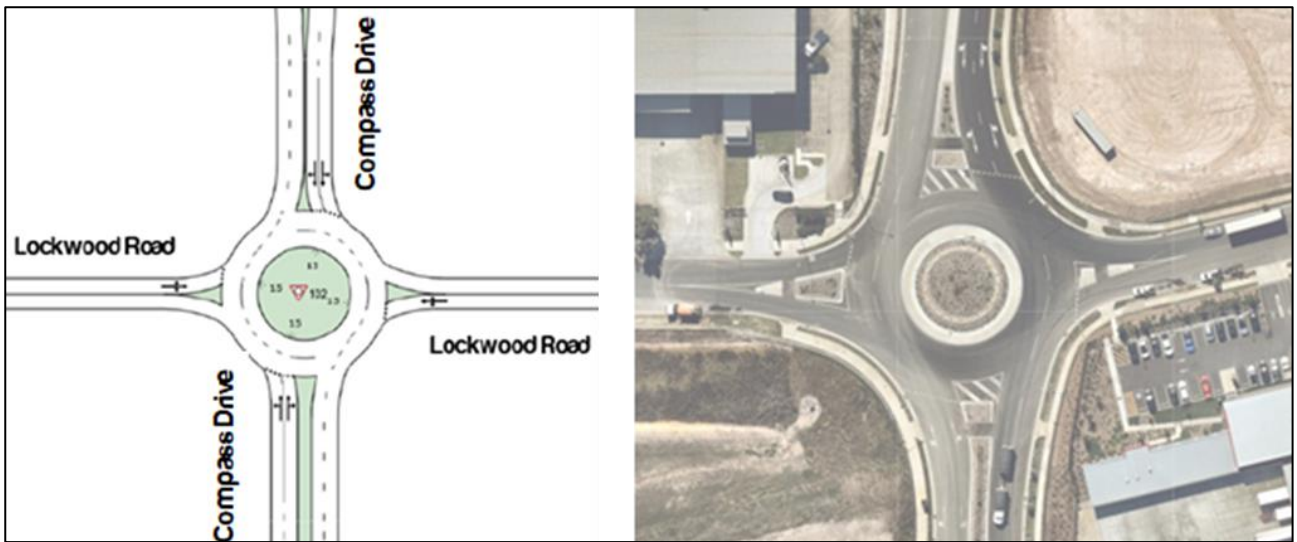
Intersection Layout of Compass Drive & Lockwood Road
